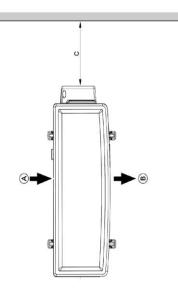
Possible installation of AIR BASIC 109 or AIR BASIC 211 outdoor unit
